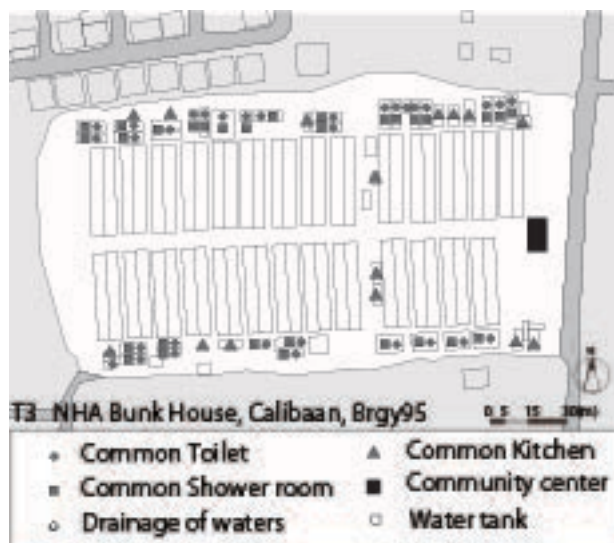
10: Site Development Plan of T3 – IPI Bunk House, Calibaan
